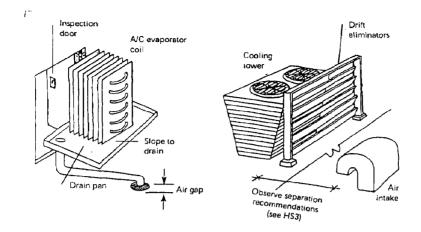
Some methods of avoiding standing water in HVAC equipment (Sheltair, 1994)
